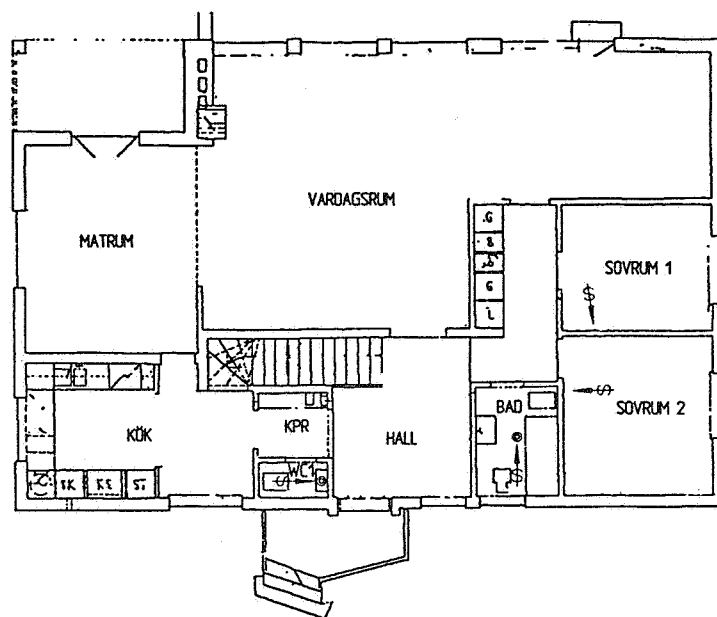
First floor plan with exhaust air points for one of the test houses. This 1 1/2-story house was built 1960 and the floor area is 133 m² for this floor.
